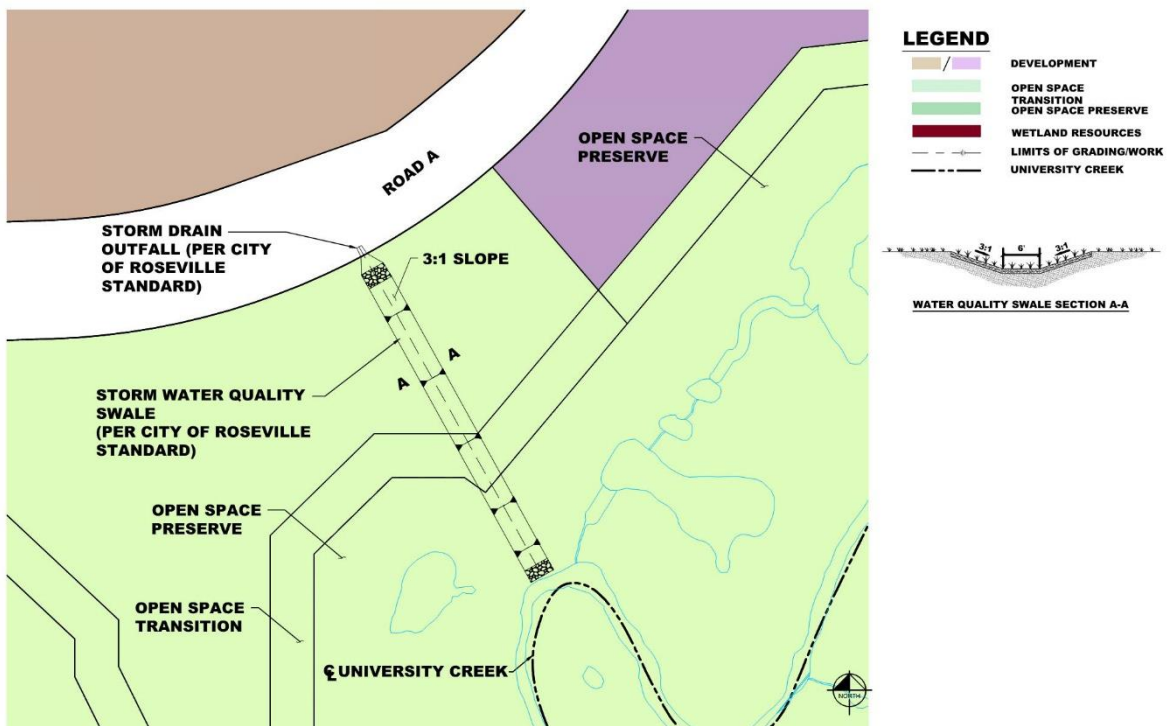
Typical Open Space Transition at Storm Drain Outfall
